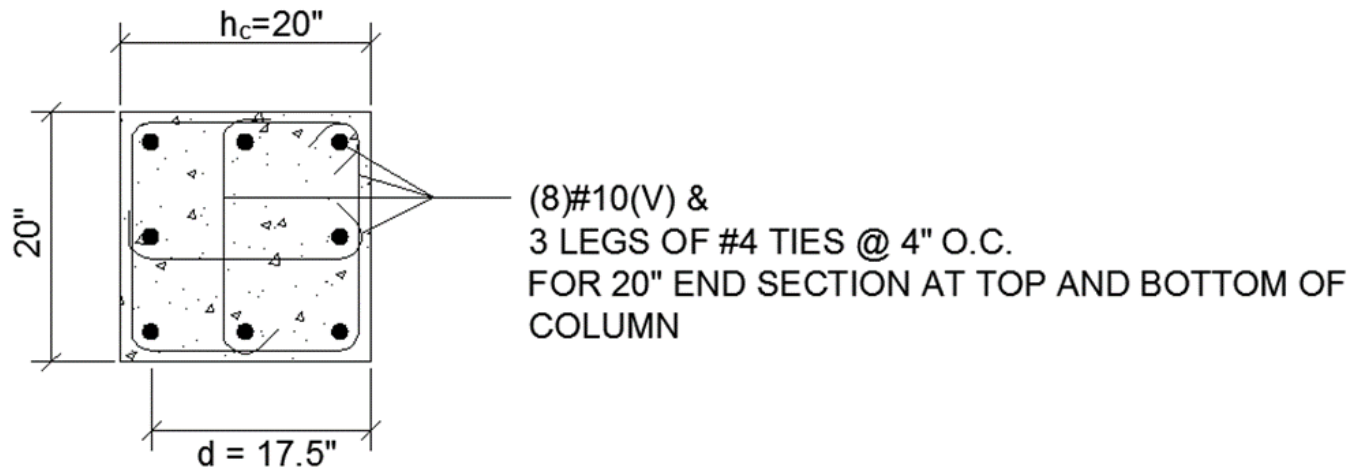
Exterior column, cross section at end of column at the 2nd floor level based on tsunami design requirements.
